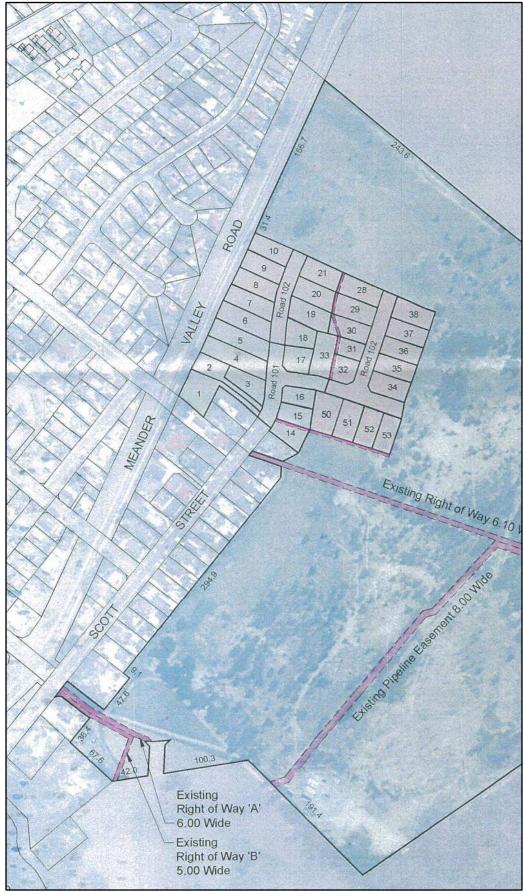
locality plan and plan of subdivision (PDA Surveyors, 2019)
